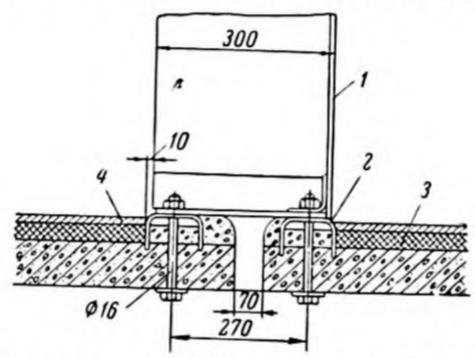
A way of fixing a control board panel: 1-panel frame; 2-embedded frame of channels, or bent-channel shapes; 3-concrete grouting 4-finished floor surface
